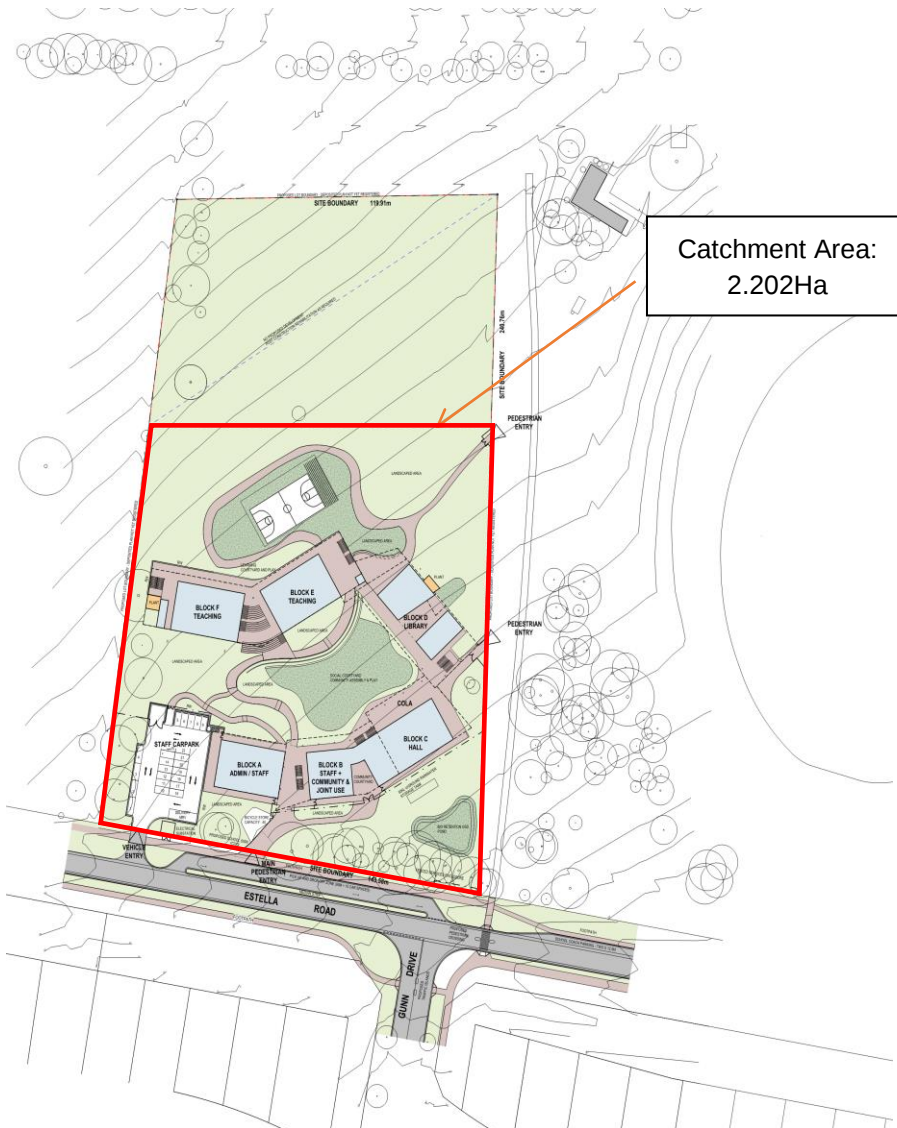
Plan of Subject Site under Proposed Development Conditions.
